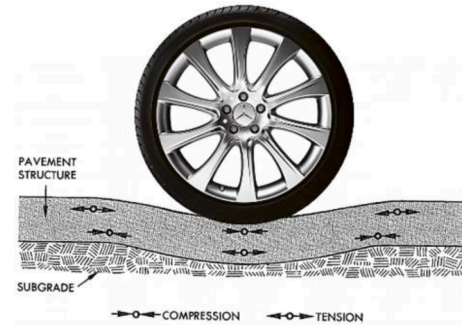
Pavement deflection in tensile and compressive stress in a pavement structure [31].
